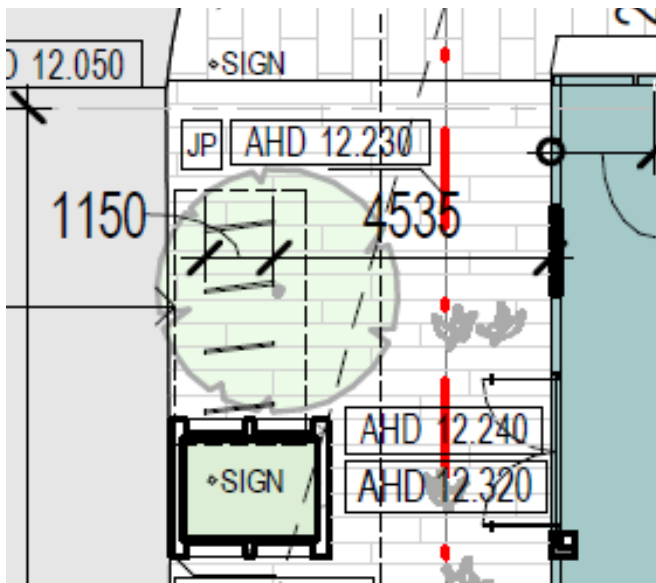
four existing hoops at the corner of Burnley and Swan Street should be relocated.
